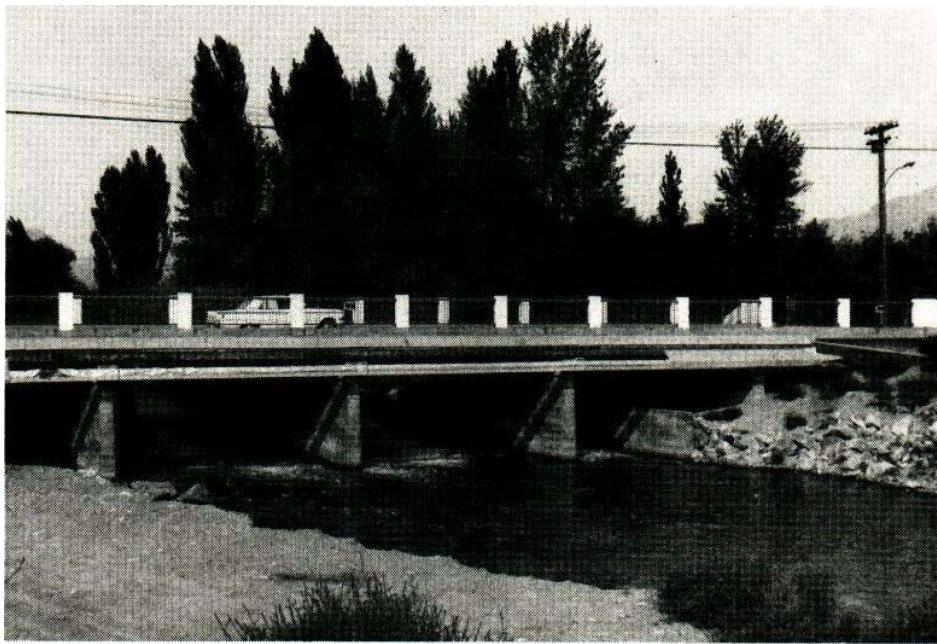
DROP STRUCTURE #12 (Road Type) AT OLIVER
